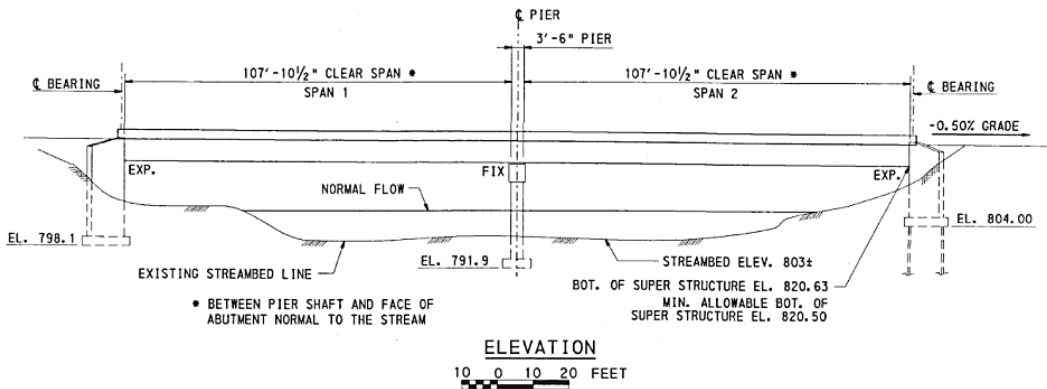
As-Built Plan (Elevation View) Bridge No. 22266
